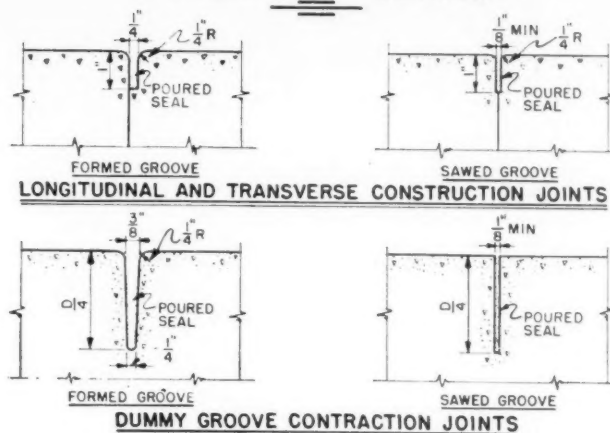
Detail showing dummy groove contraction joints and the longitudinal and transverse construction joints for pavements.
